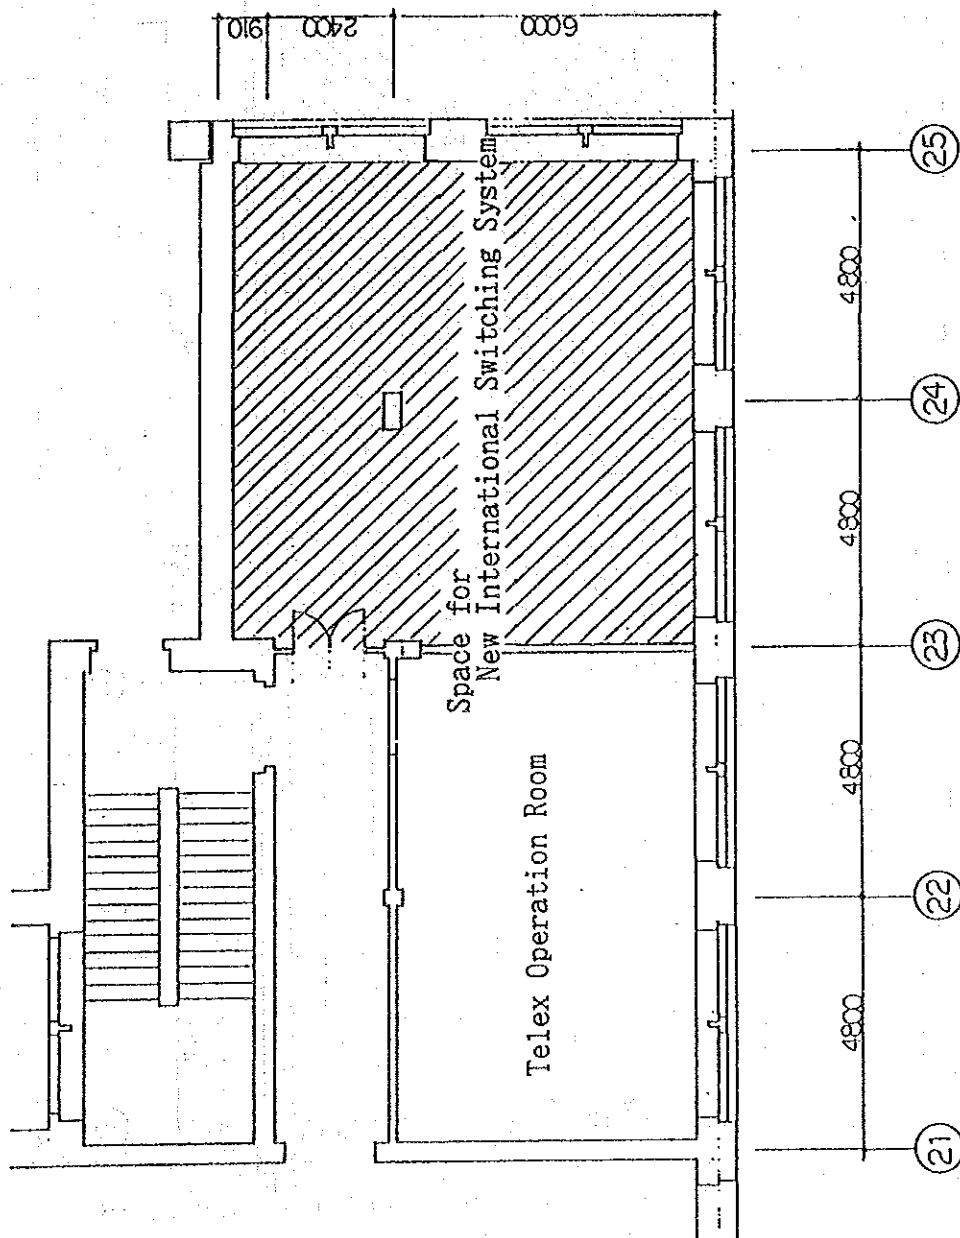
Floor Layout of Central Office Building (3F)
